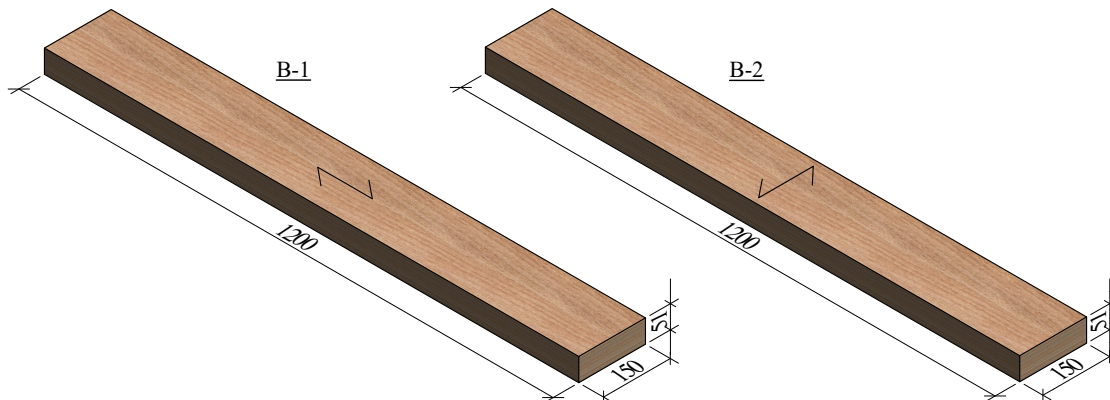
Dimensions of the specimens tested in 4-point bending.
